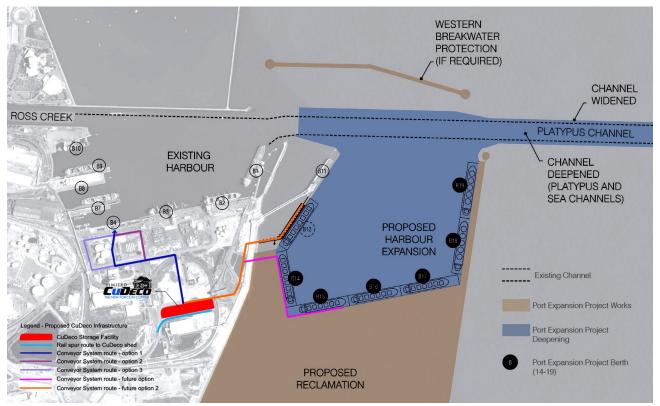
Port of Townsville - Port Expansion layout, with proposed CuDeco infrastructure shown, including temporary Berth 4 loading areas and option for possible proposed future locations of Berths 12, 14 and 15.
